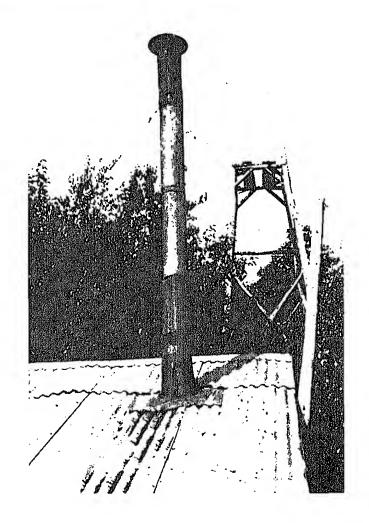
Roof Planks Ends at East Elevation 6/28/83 D.C. Anderson
